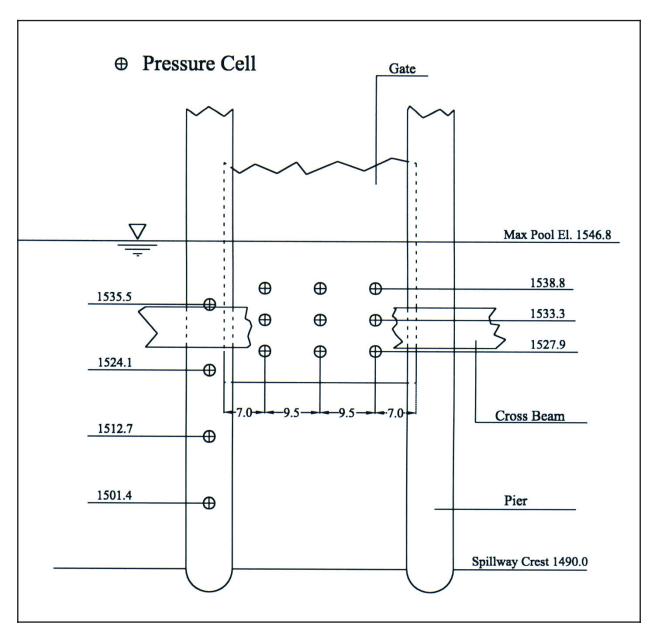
Spill gate and pier pressure cell locations, looking downstream
